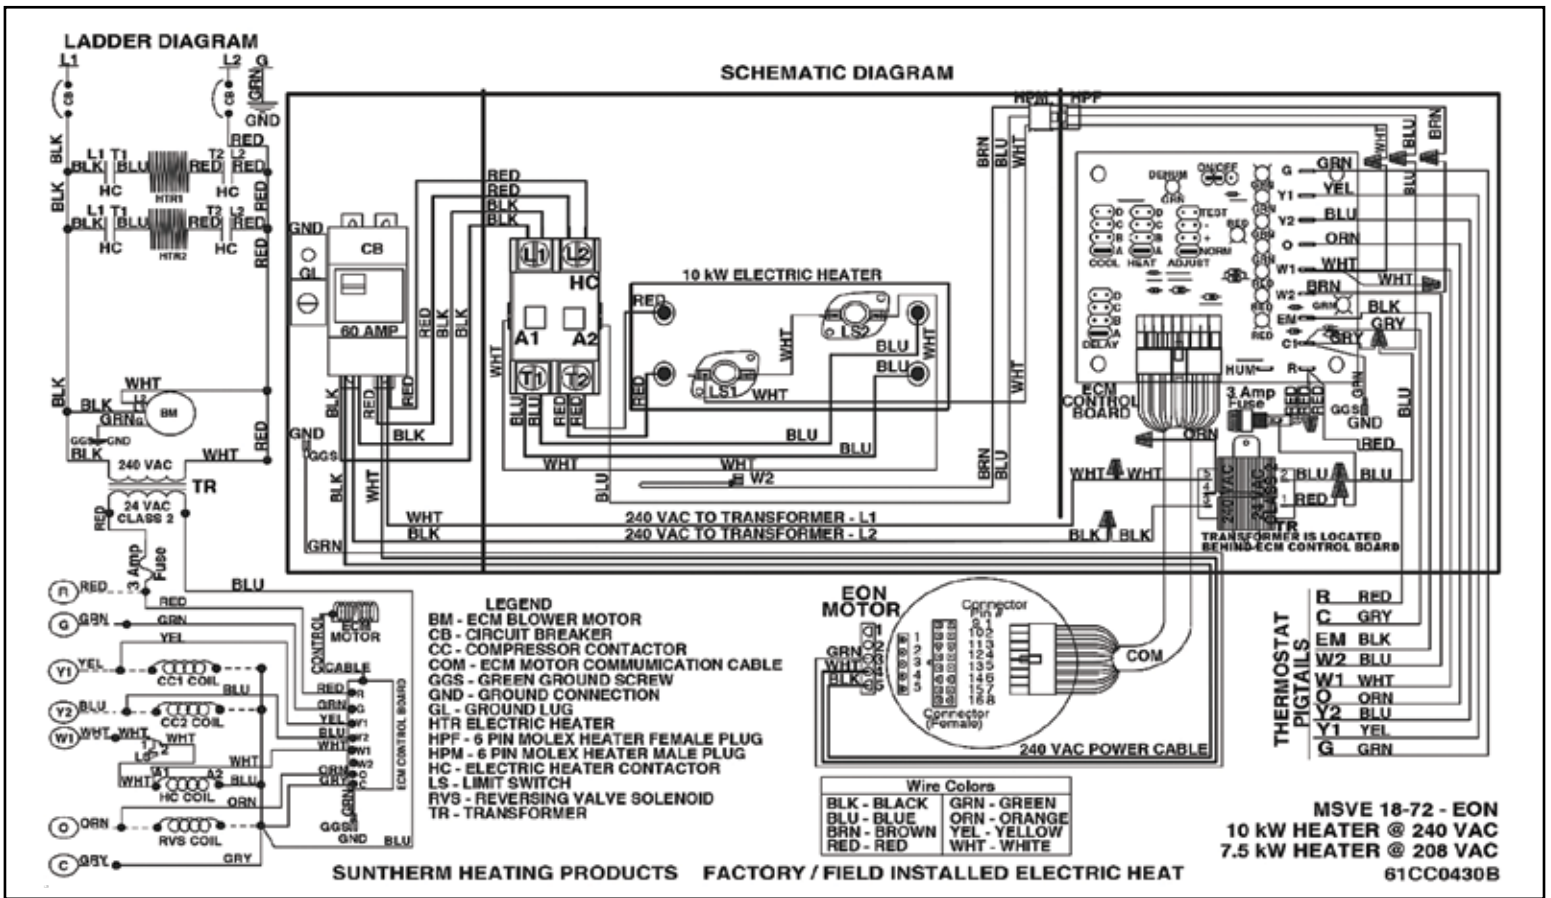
MSVE 18-72 – ECM Motor – 10 kW Electric Heater
